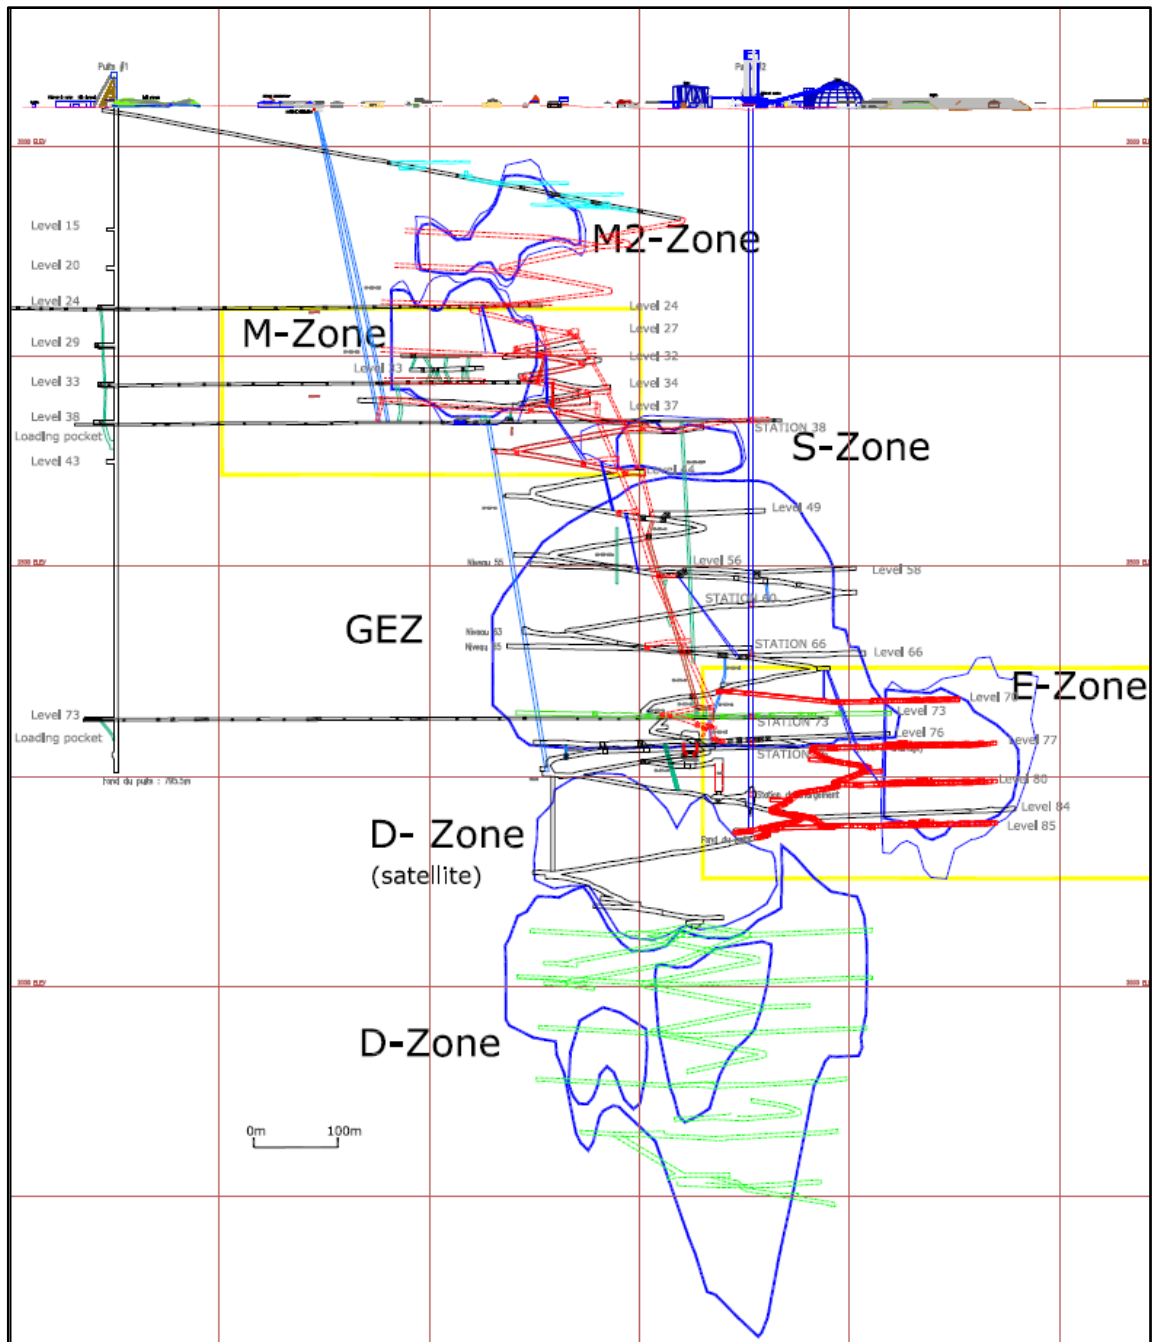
Underground mine layout of Goldex deposit looking north
